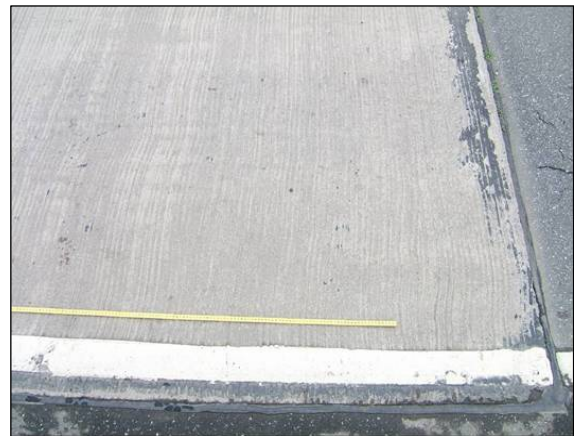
Surface of the settling slab cast using bio ash concrete of the demo bridge. A grid of fine cracks were observed in the surface as well as a few small break-offs at the dilation joint.
